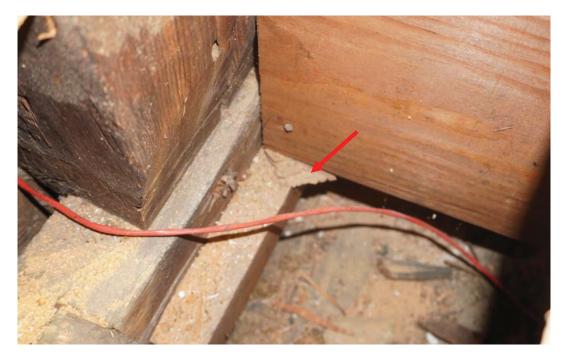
New wood joists have been installed going east to west bearing on wood ledge that has been nailed into girder. It is unclear why this was done. Further investigation required (Probe #12).
